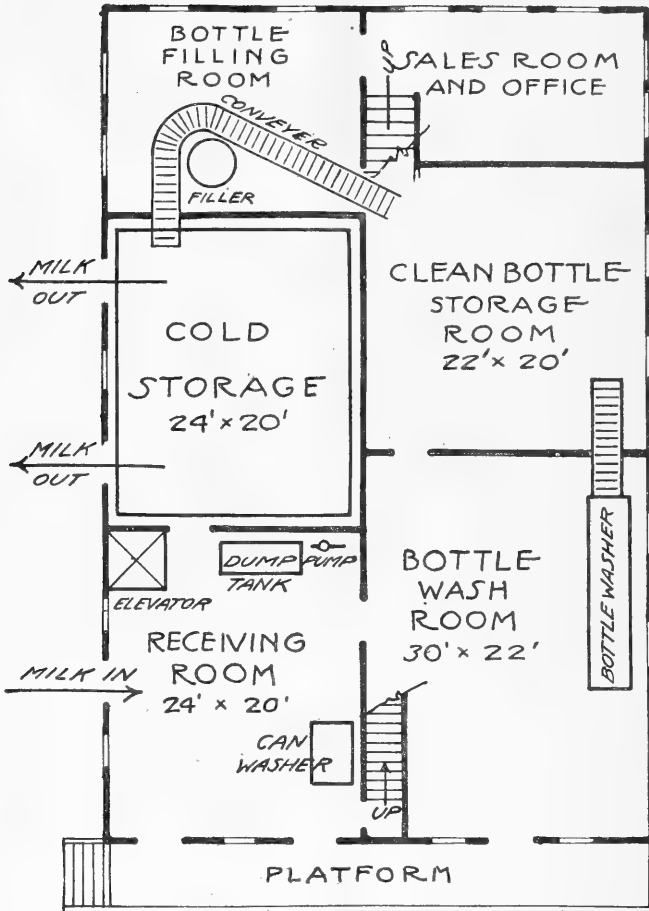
First-floor plan of a two-story plant of from 2,000 to 3,000 gallons' daily capacity.
